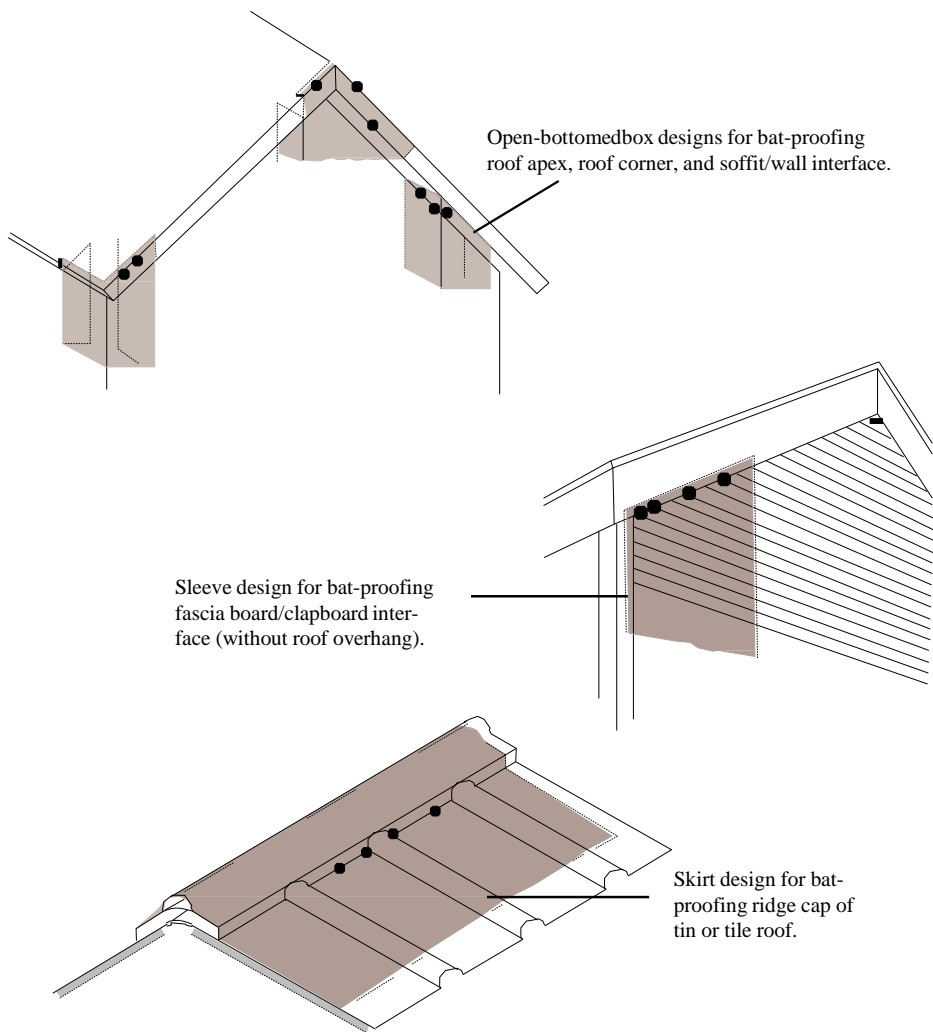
Sample configurations for Frantz' checkvalve (Key:  = bird netting; = attaching to structure; • = exit/entry holes of bats).
